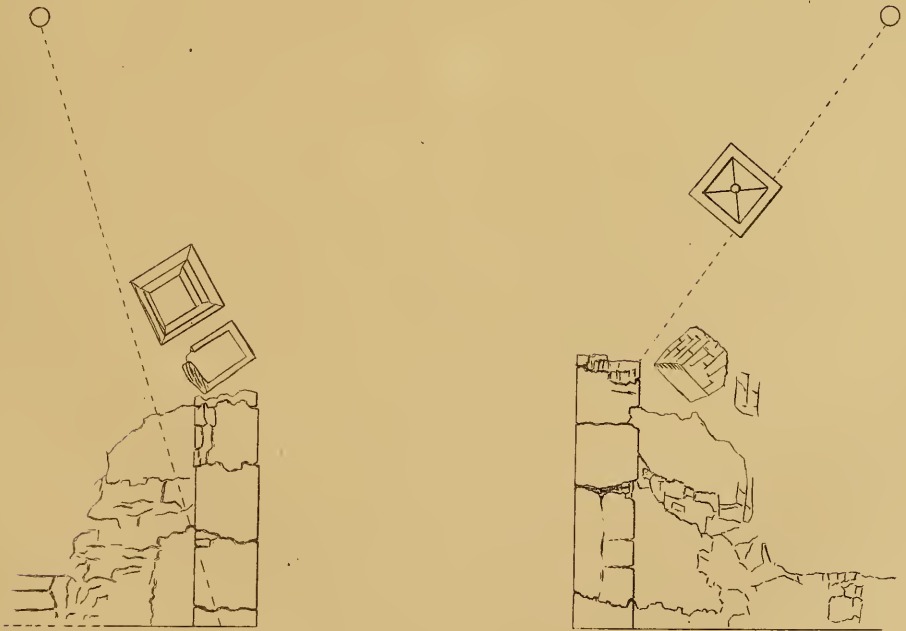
Sketch Plan of overturned Cemetery gate pillars Silchar.
